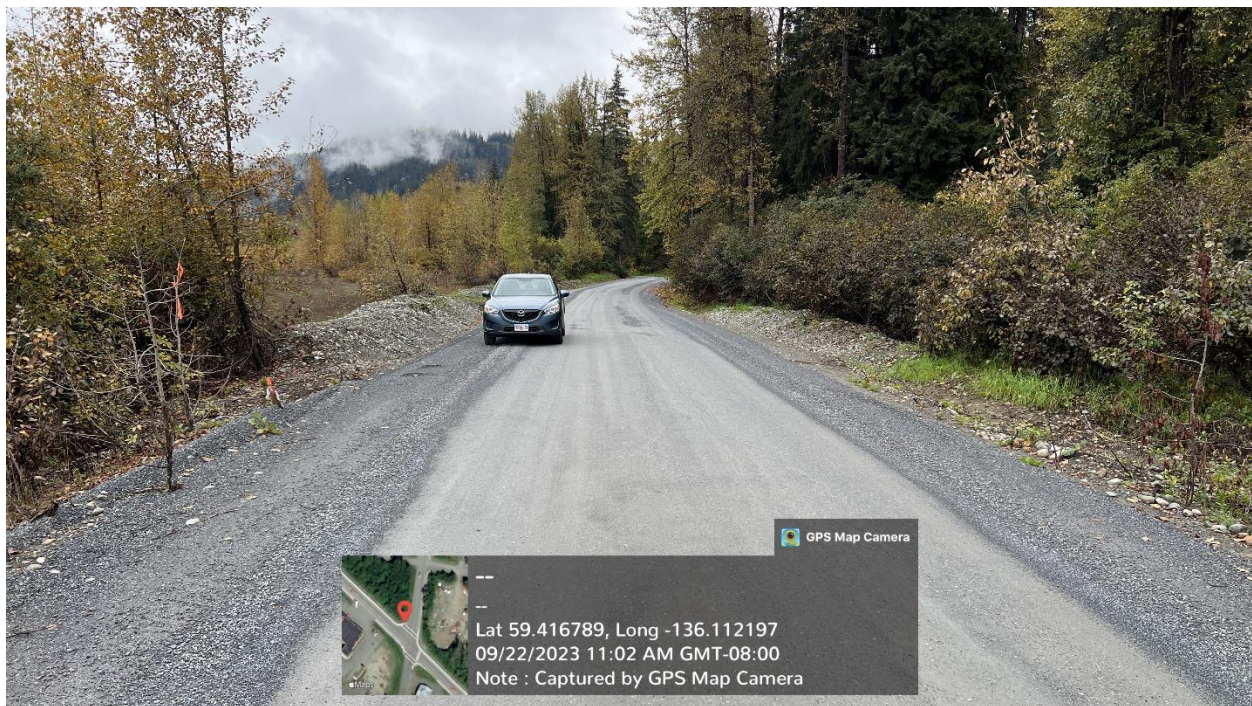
Porcupine Trail Road Phase I stop of work, photo facing beginning of road. Same location as Figure A.11.
